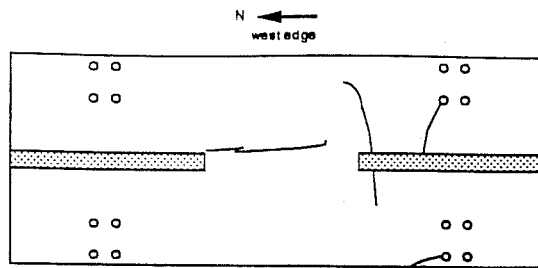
Sp. 2b: Progression of Cracking of Bottom Face of Roof Slab at Load Point 177
